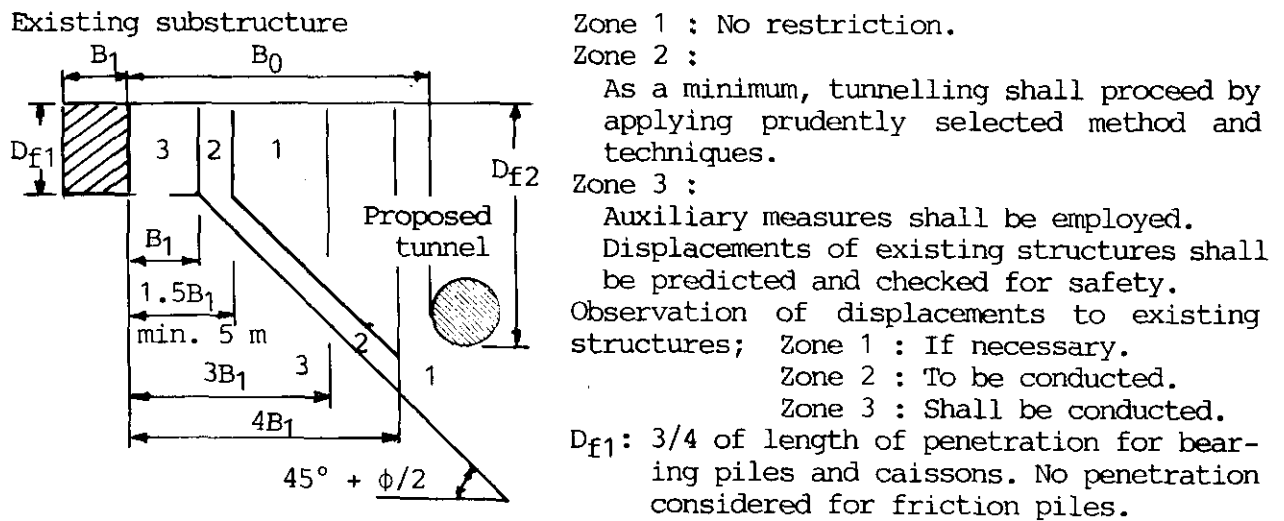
Extent of protection for adjacent substructure of expressway during shield tunnelling (Otogawa - 1983).
